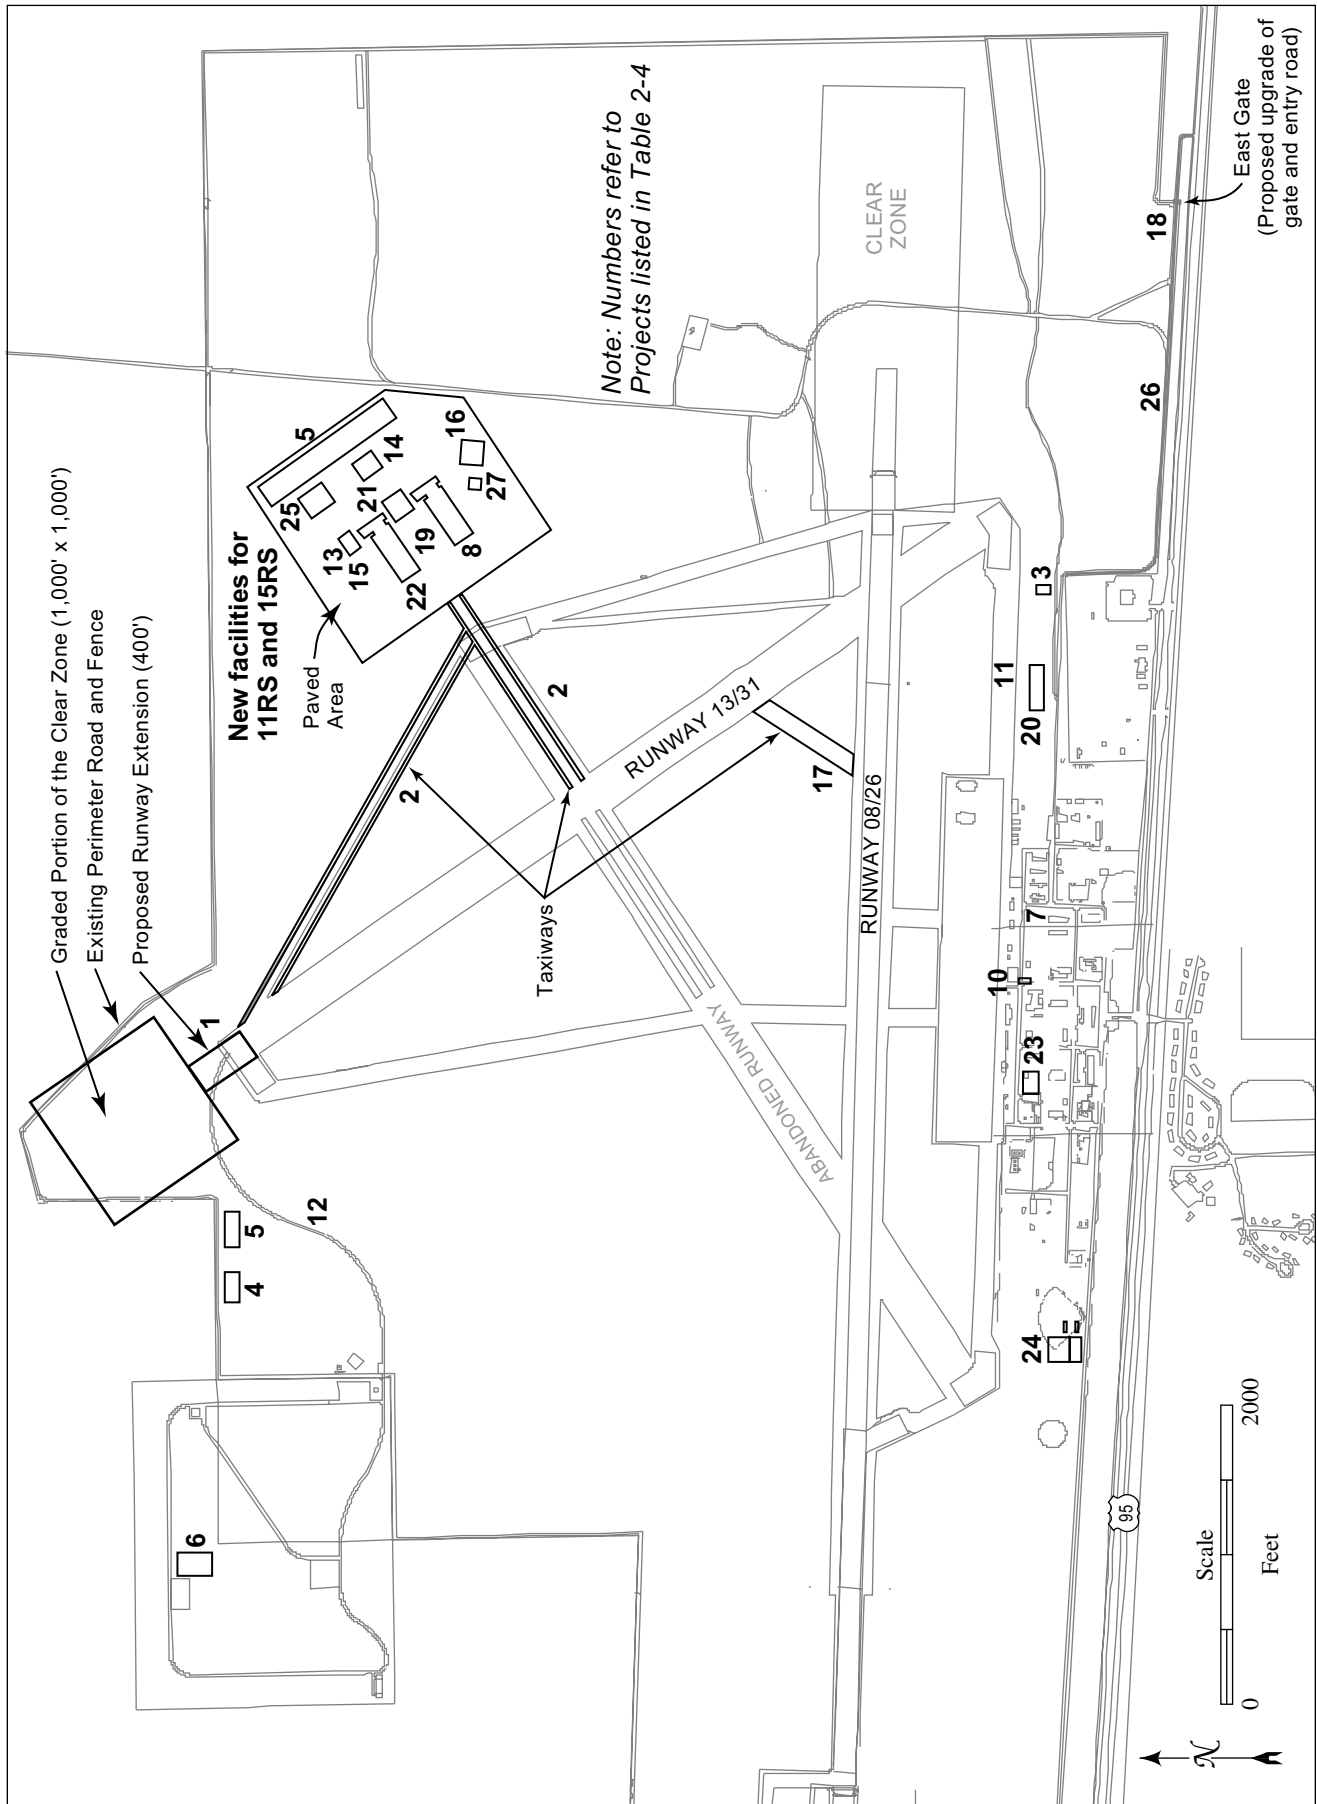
Alternative A or Alternative B Proposed Beddown Facilities
